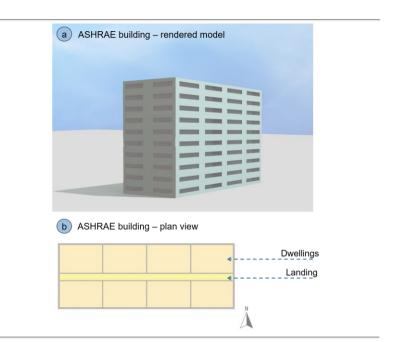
ASHRAE test building: a) 3D view; b) plan view and thermal zones
